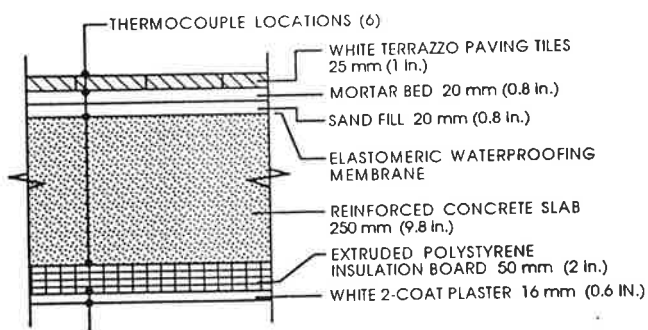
Roof 5: internally insulated (extruded polystyrene) concrete slab.
